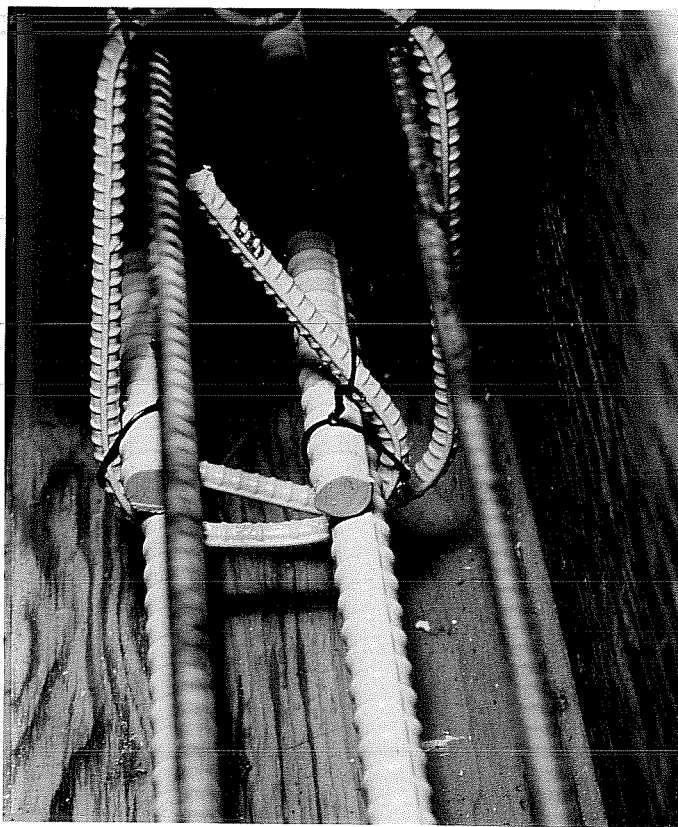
Steel Detailing of Group I Beam Specimen.
